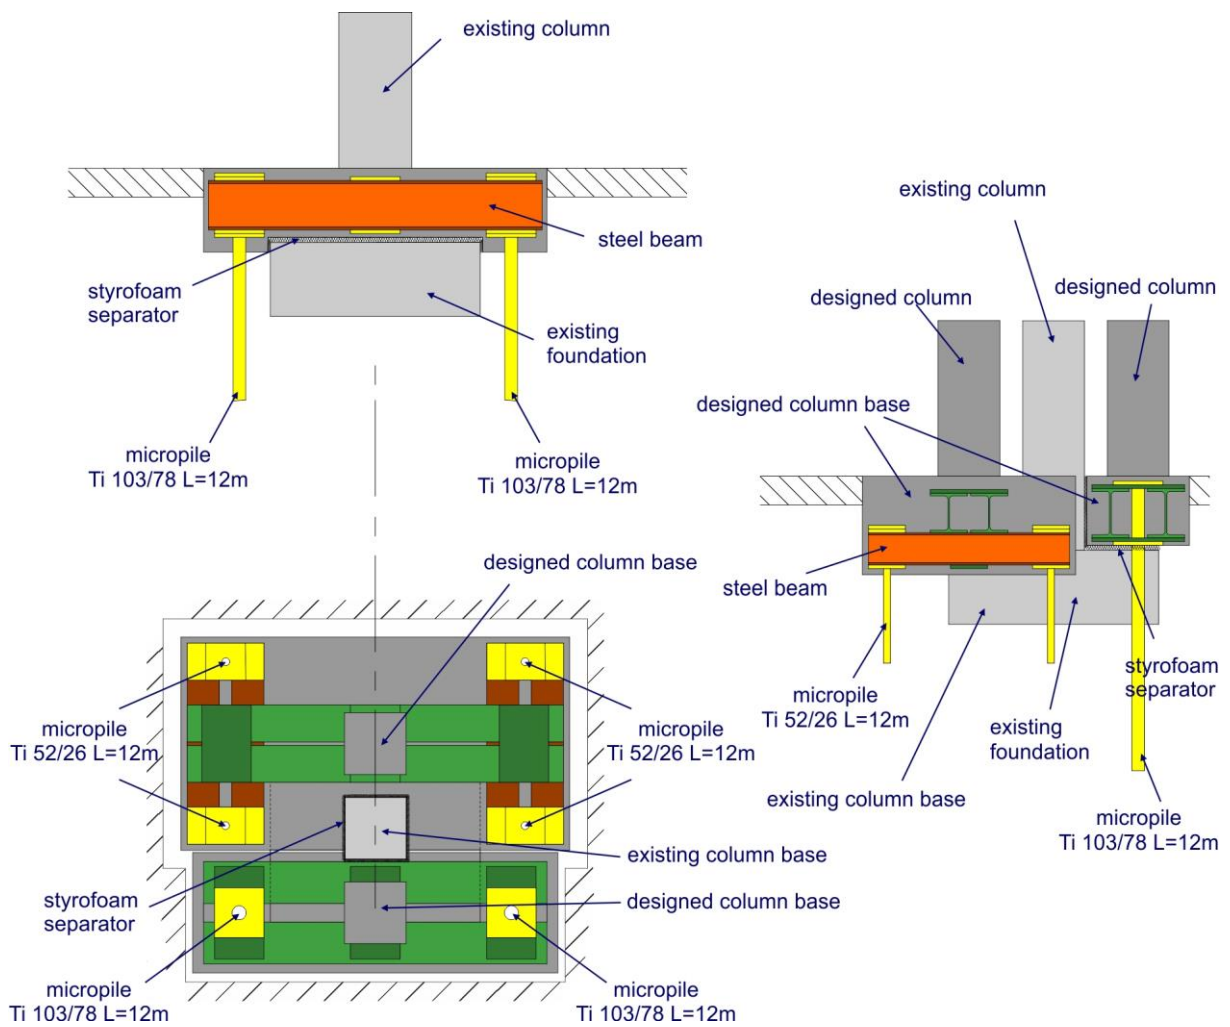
Scheme with additional supports beyond the block foundation, apparent mounting irons of the additional precast column
